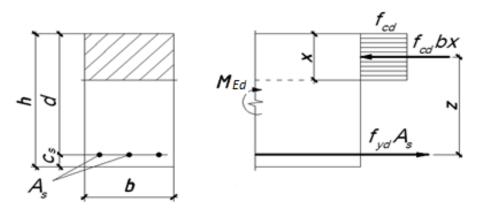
Design diagram of normal section in the strength design of rectangular members with single reinforcement
